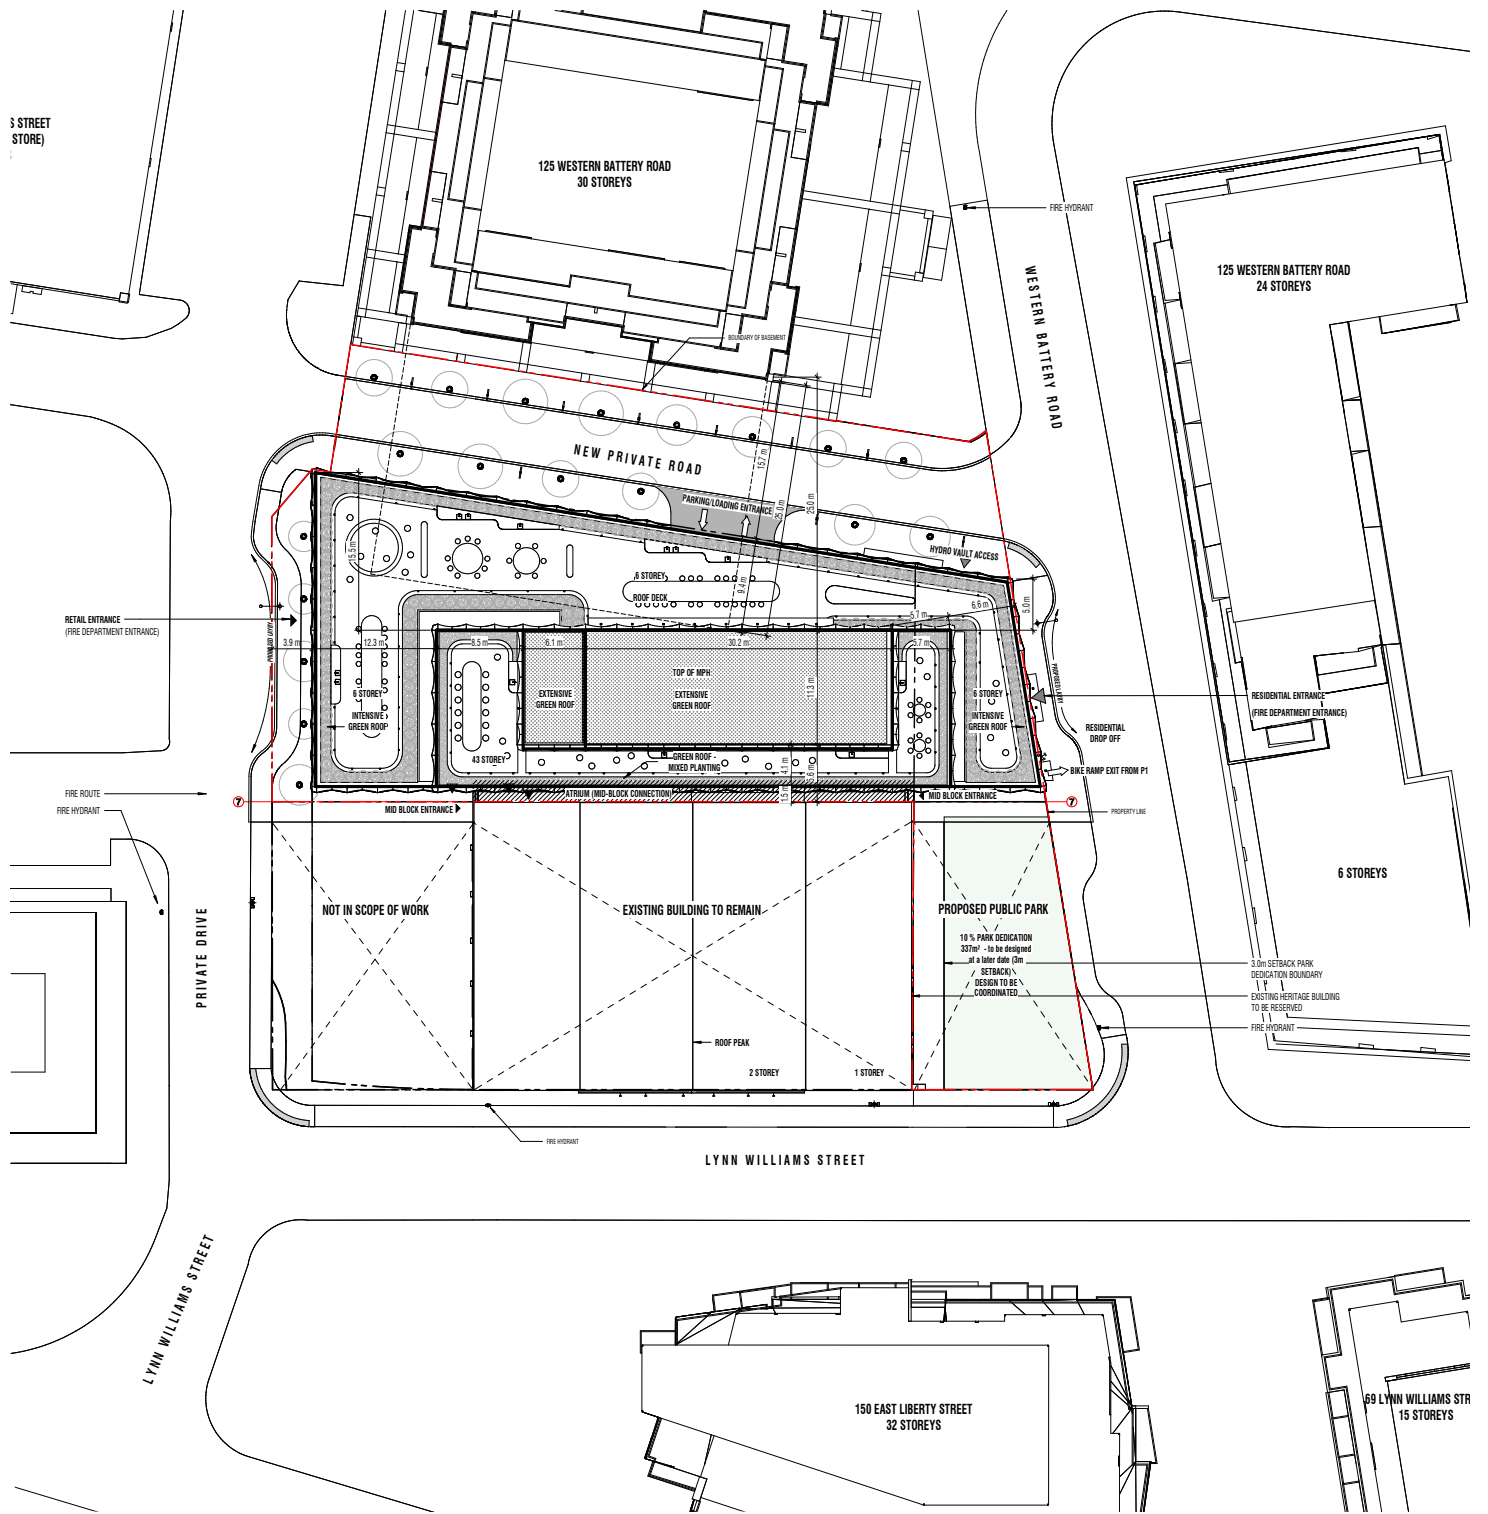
Site / Roof Plan (Prepared by gh3* Architects)
